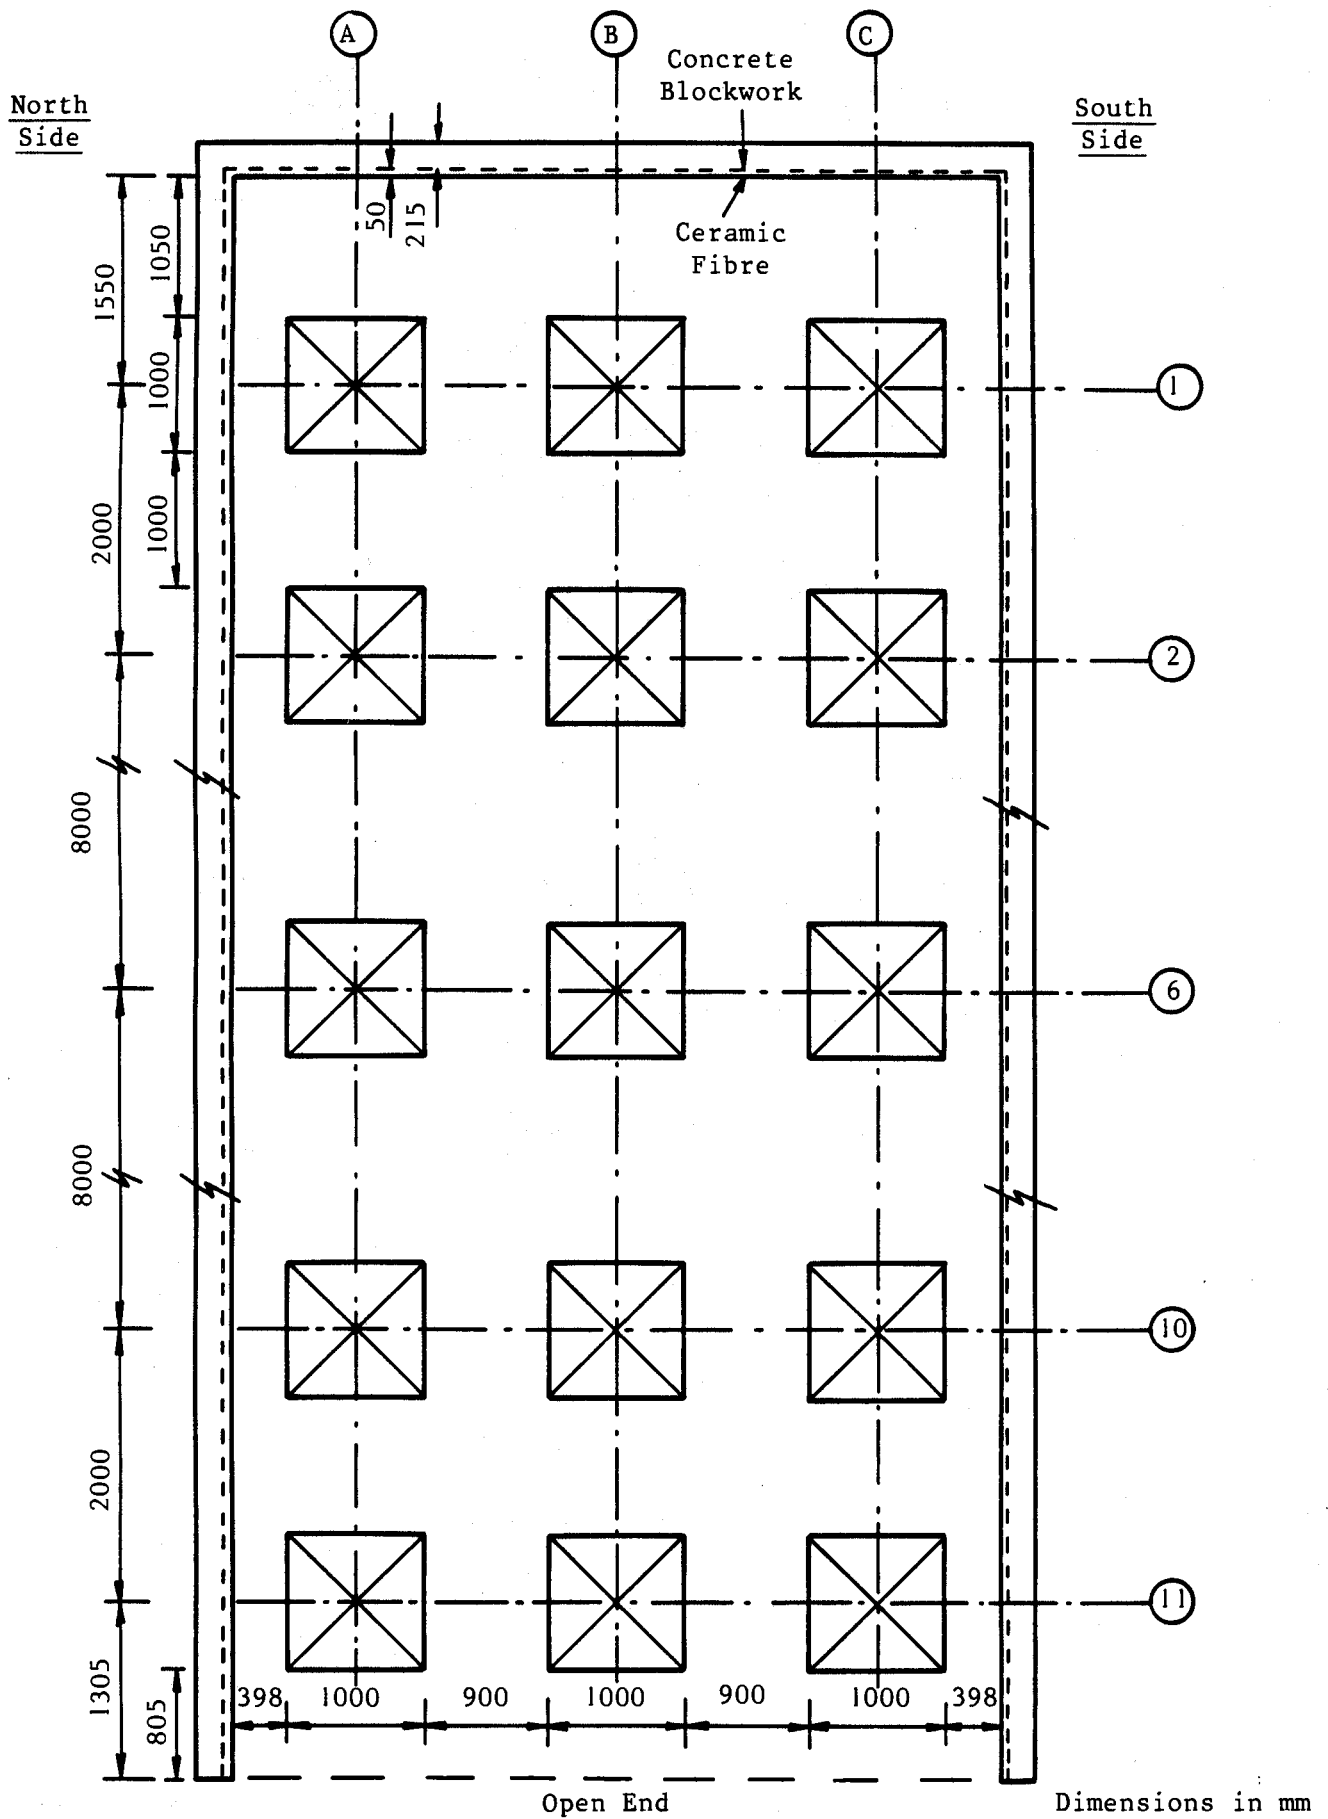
COMPARTMENT PLAN DETAILING THE LAYOUT OF THE CRIBS (R4/1359)
